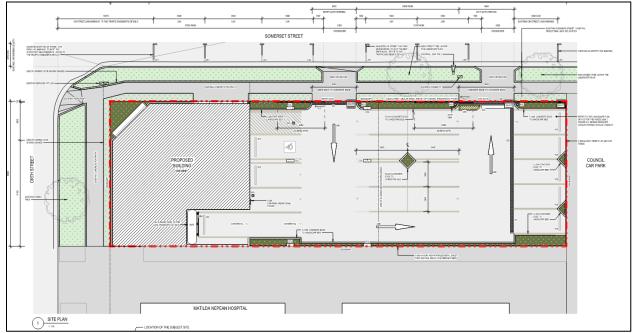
Site Plan (Source: Bell Architecture, 2023)
